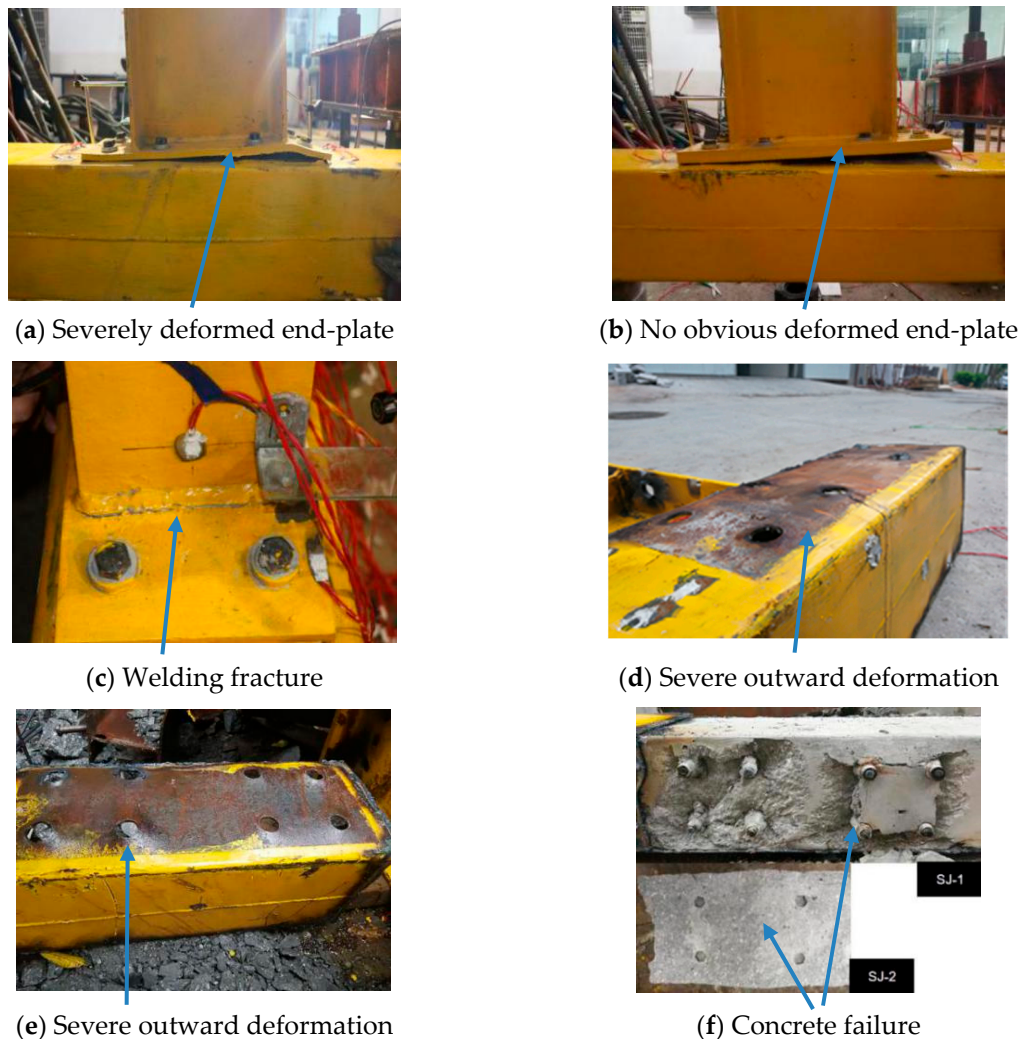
Failure mode I. (a) SJ-1; (b) SJ-2; (c) welding fracture in specimen SJ-1; (d) column wall in specimen SJ-1; (e) column wall in specimen SJ-2; (f) core concrete.
